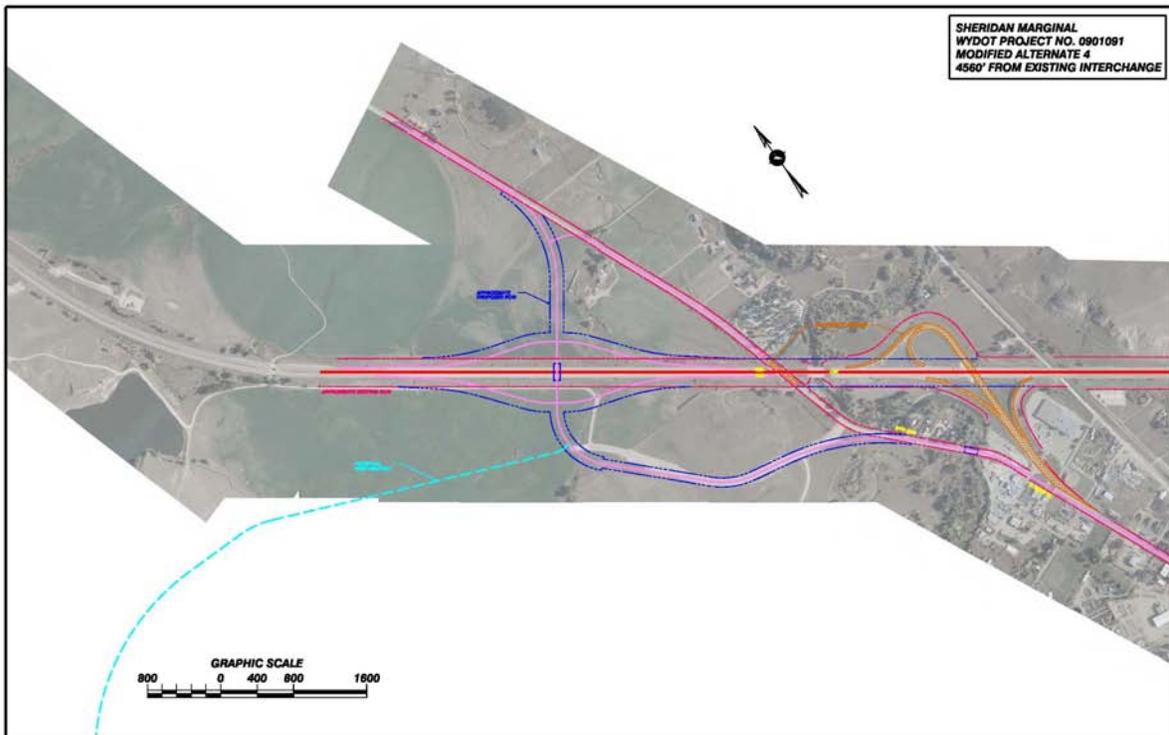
Modified Alternative 4: Diamond Interchange Close to Decker Road: This alternative would construct a diamond interchange about 2,300 feet west of existing Decker Road and about 4,560 feet northwest of the existing interchange. The existing North Sheridan Interchange would continue to carry traffic until construction of the proposed interchange is complete.
